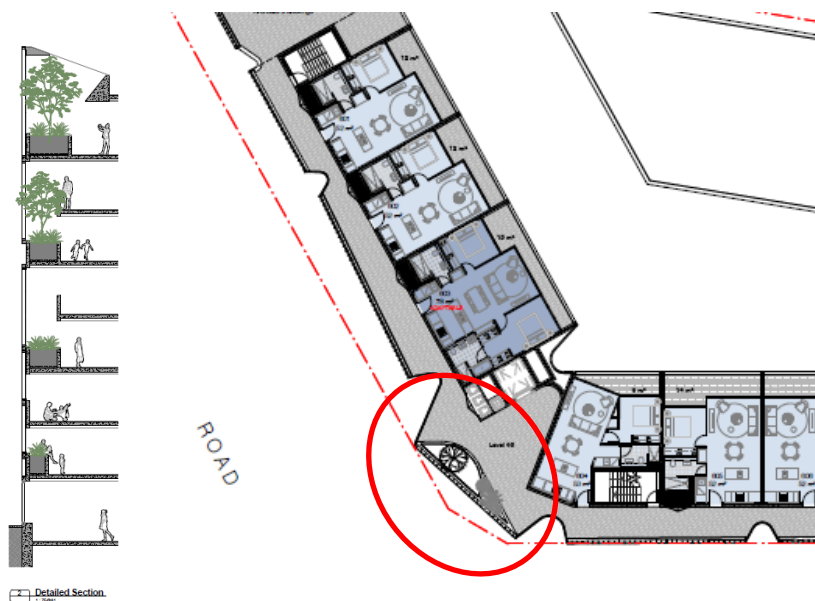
Section detail showing planting & plan view (Level 6) showing planter at Devlin Street and Victoria Road building intersection.
